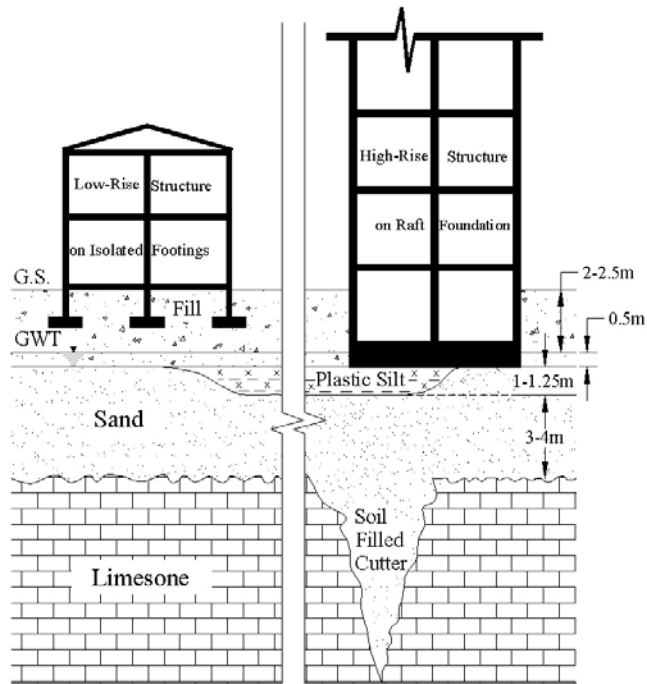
Schematic drawing showing the worst possible subsurface layering conditions for low and high-rise structures.
